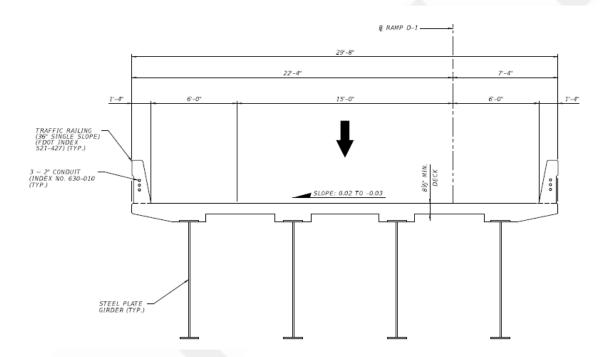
Bridge Typical Section (Bridge No. 15)
